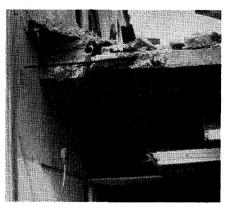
"Friction Connection" of a lateral beam to a tiltup bearing wall. Note that the angle beneath slab was added subsequent to original construction.
